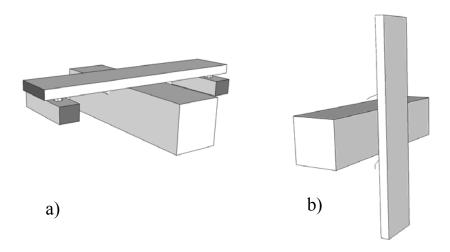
Examples of tested details with horizontal (a) and vertical (b) contact zones (moisture traps)
